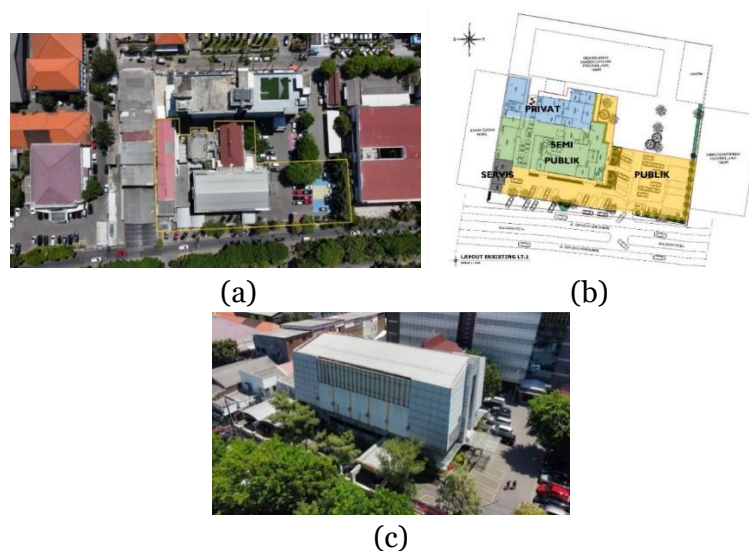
(a) Location of the PRKPCK East Java Office Building, (b) Existing Layout of the PRKPCK Office Building, and (c) Side View of the Building Facing the South Side
